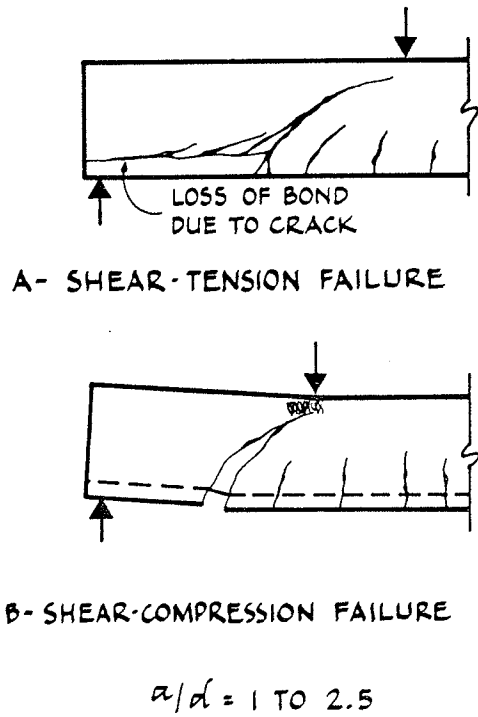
TYPICAL SHEAR FAILURES IN SHORT BEAMS
